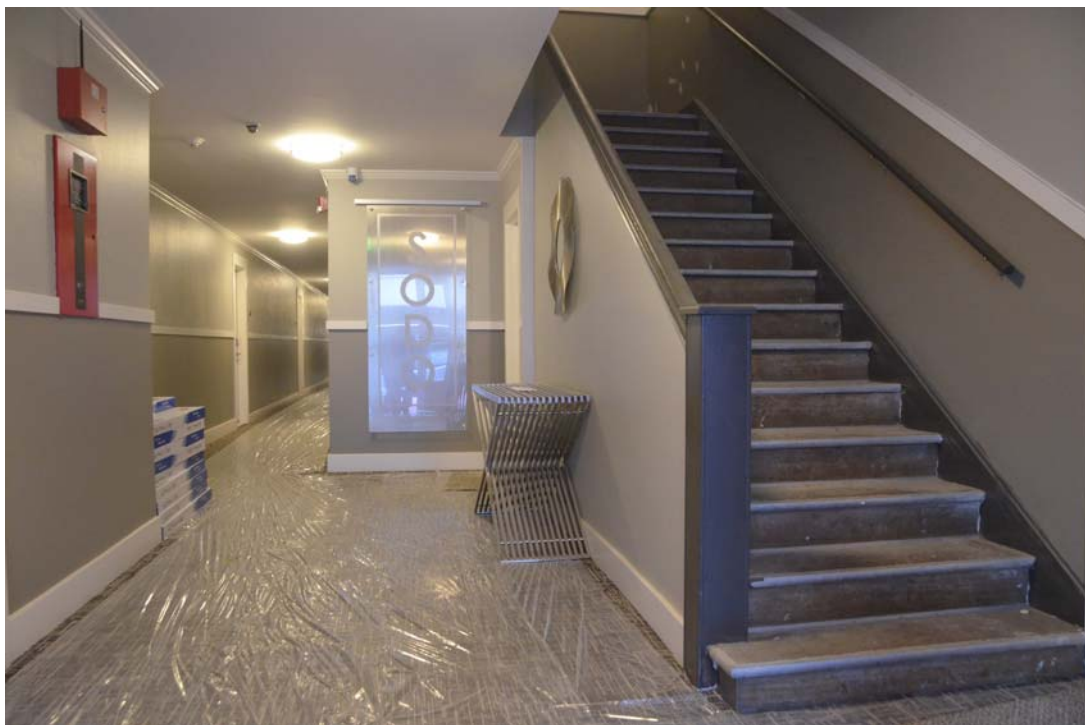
Front Entry Lobby looking north at stairs to 2nd floor and 1st floor central hallway
